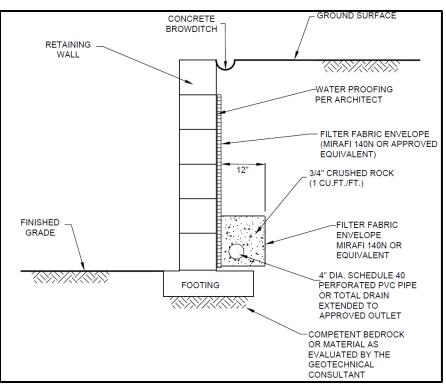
Typical Conventional Retaining Wall Backdrain Detail
